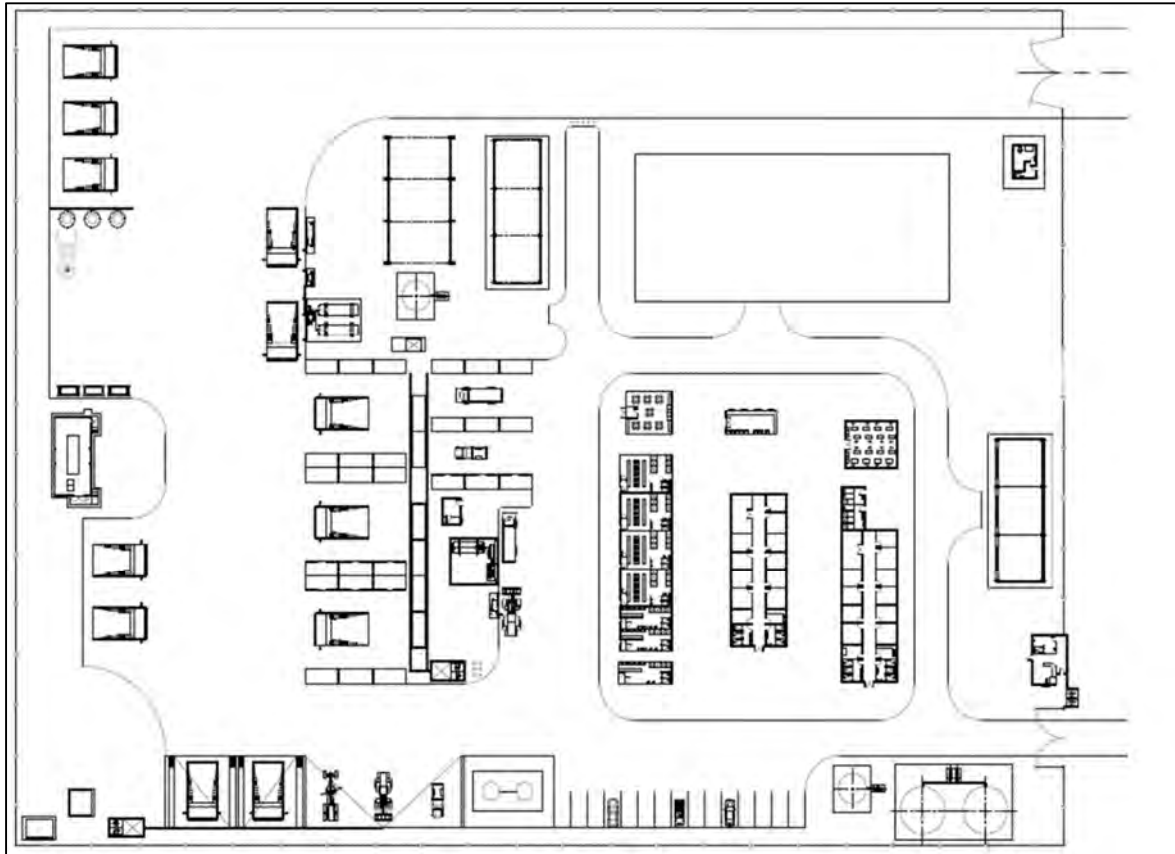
Planned infrastructure layout of the contractor's camp showing the various structures
